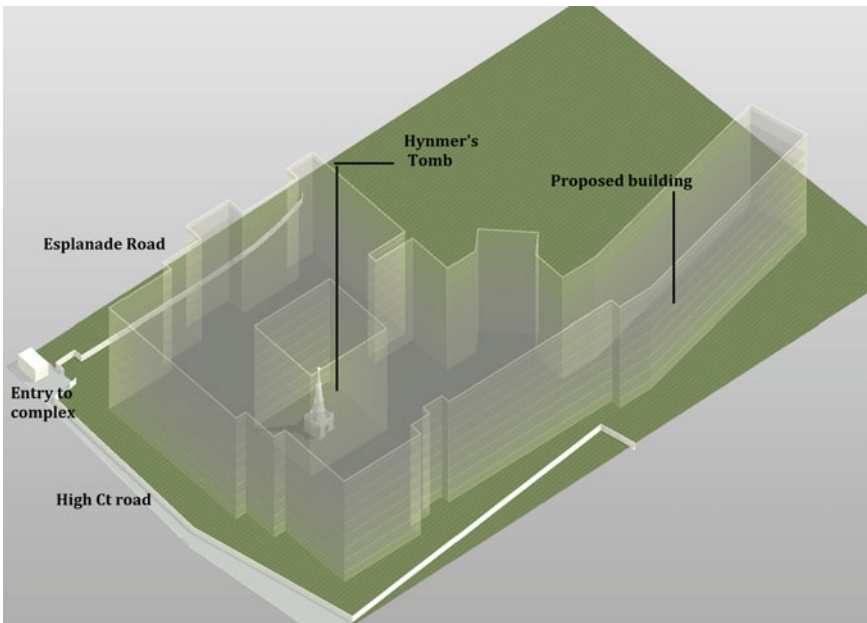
Proposed new constructions around Hynmer's Tomb
